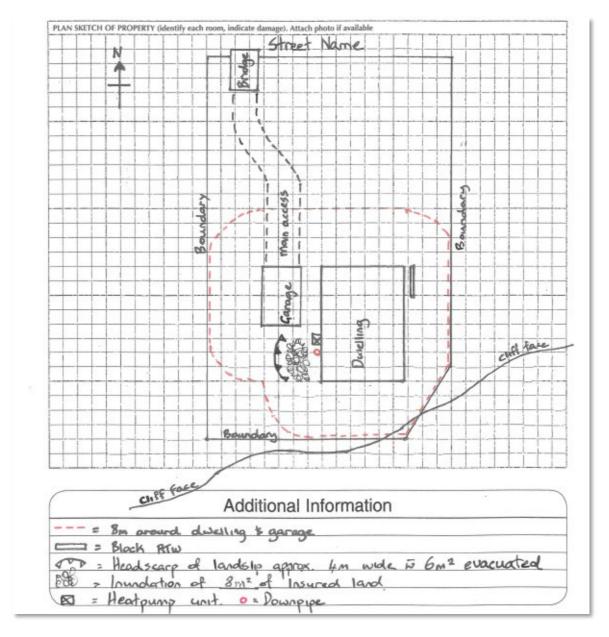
Site sketch of land damage with imminent damage to the dwelling
